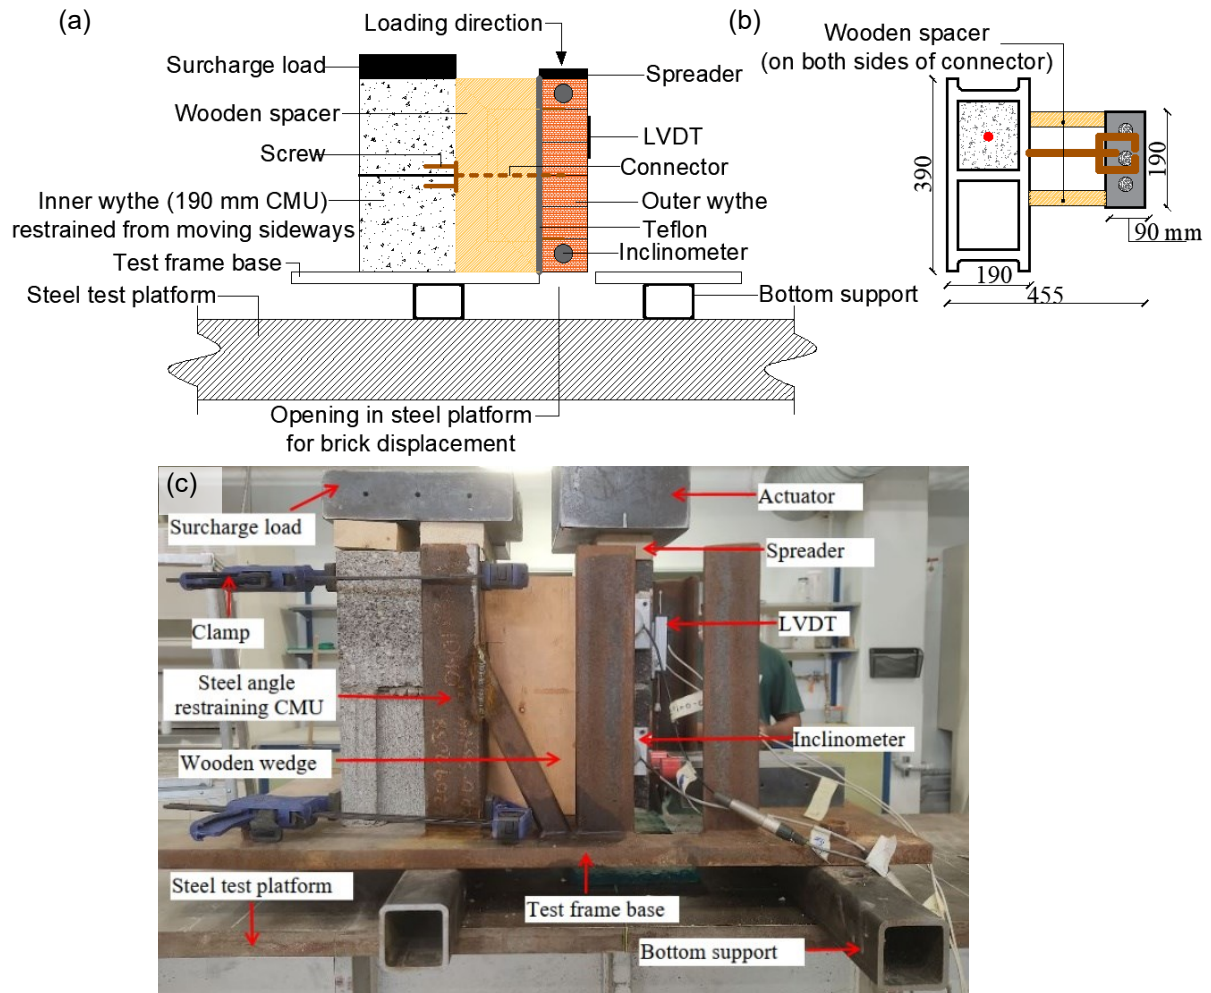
Schematic diagram of test frame (a) side view (b) plan view. (c) Photo of test setup
